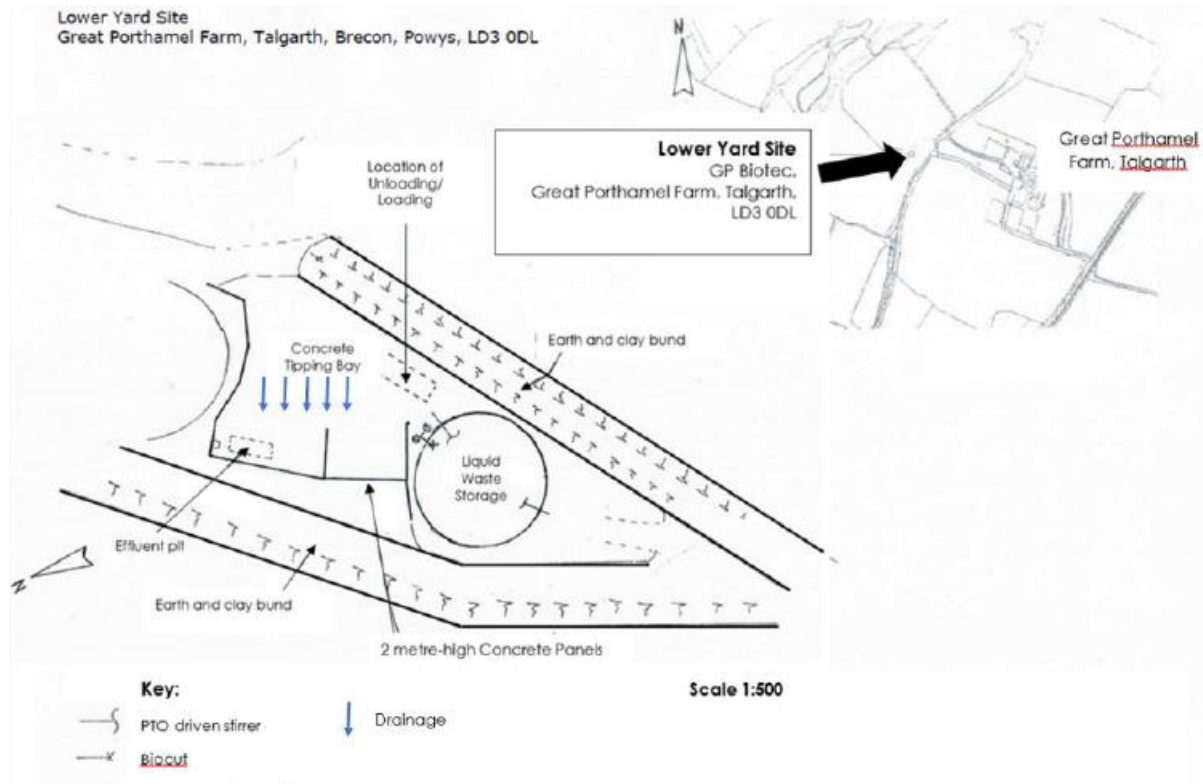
Drainage Plan of SR Area to be included within permit boundary
